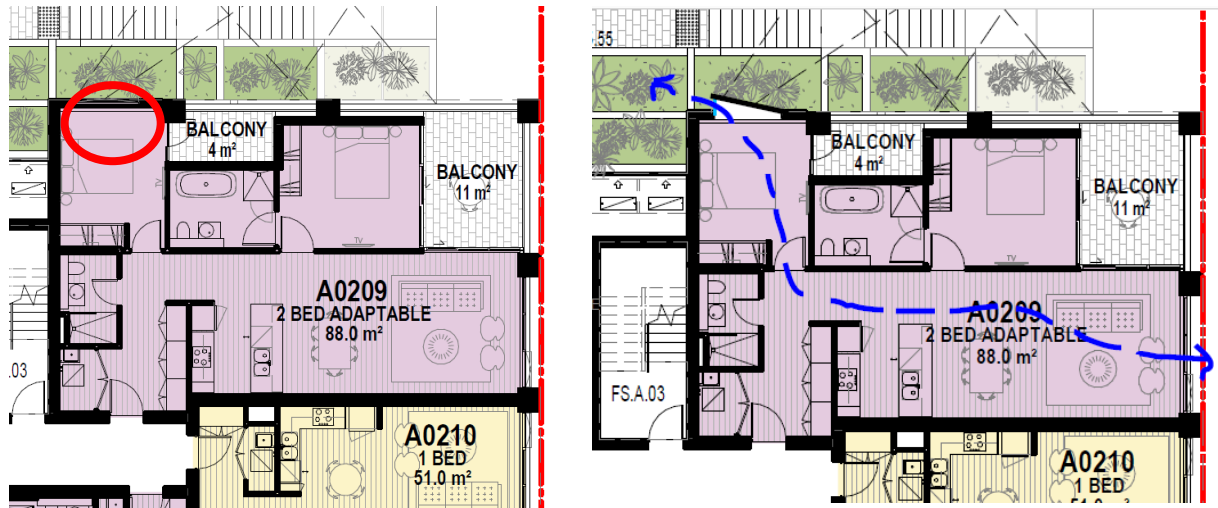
Proposed floor plan for A0209 (left) and plan showing location of required window for cross ventilation (right).
